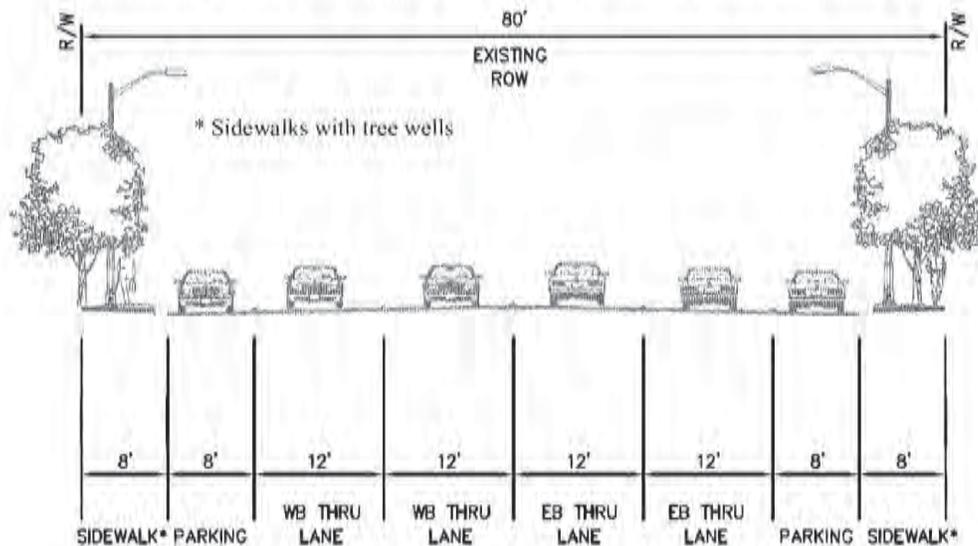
Proposed Cross Section, E Street Between 3rd Avenue and Broadway
